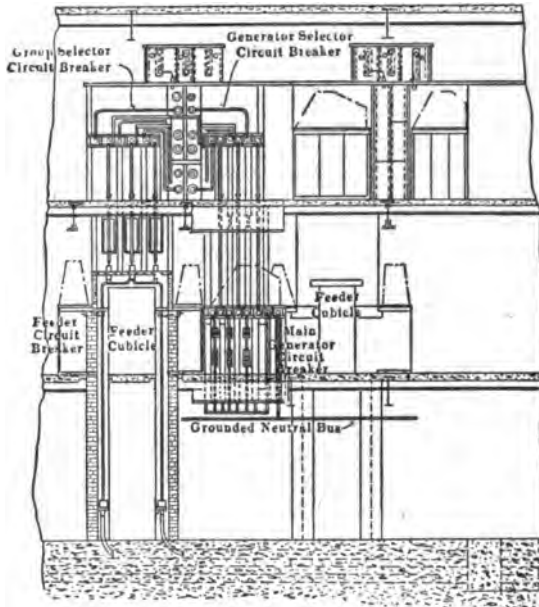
Longitudinal Section between Buses. (Westinghouse, Church, Kerr & Co.)
